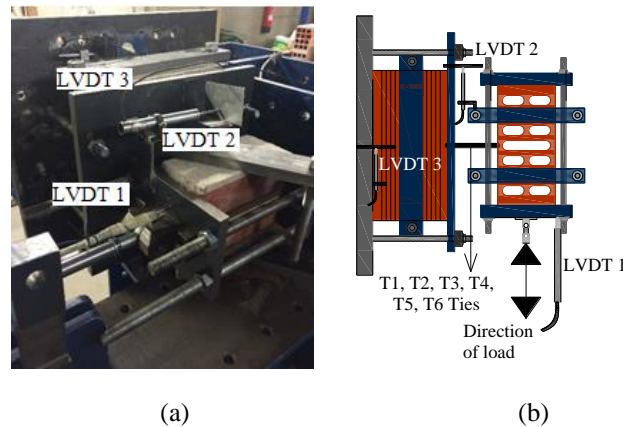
Details of shear tests for double assemblages: (a) test setup and (b) representative scheme of test setup
